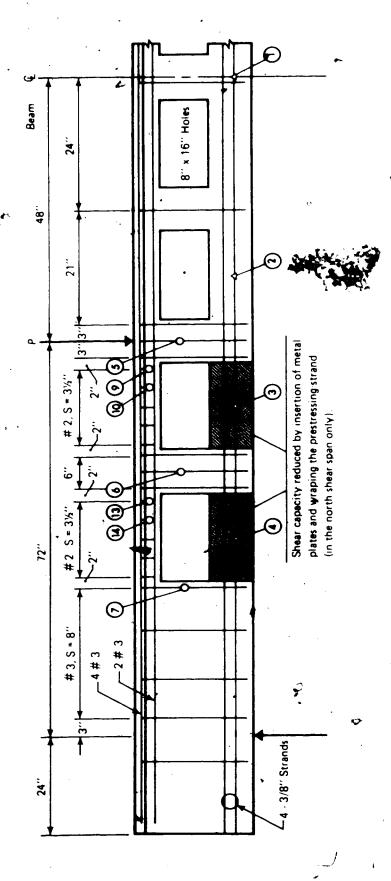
Reinforcement Details and Strain Gage Locations for Beam 4-16-6
